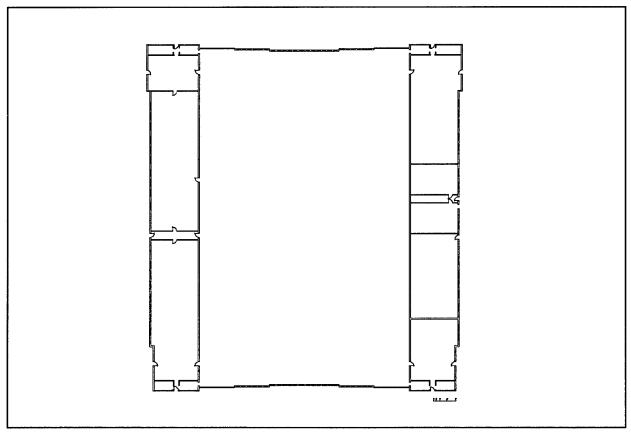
Example of a Georgian hangar floor plan (Building 2101).
